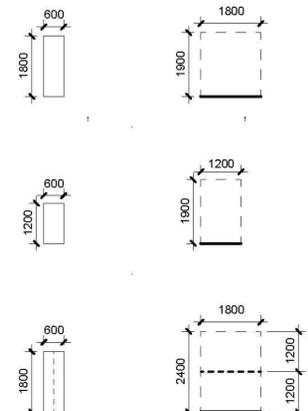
Accessible Parking Vertical Signage Figure 27: Accessible Parking Pavement Marking
